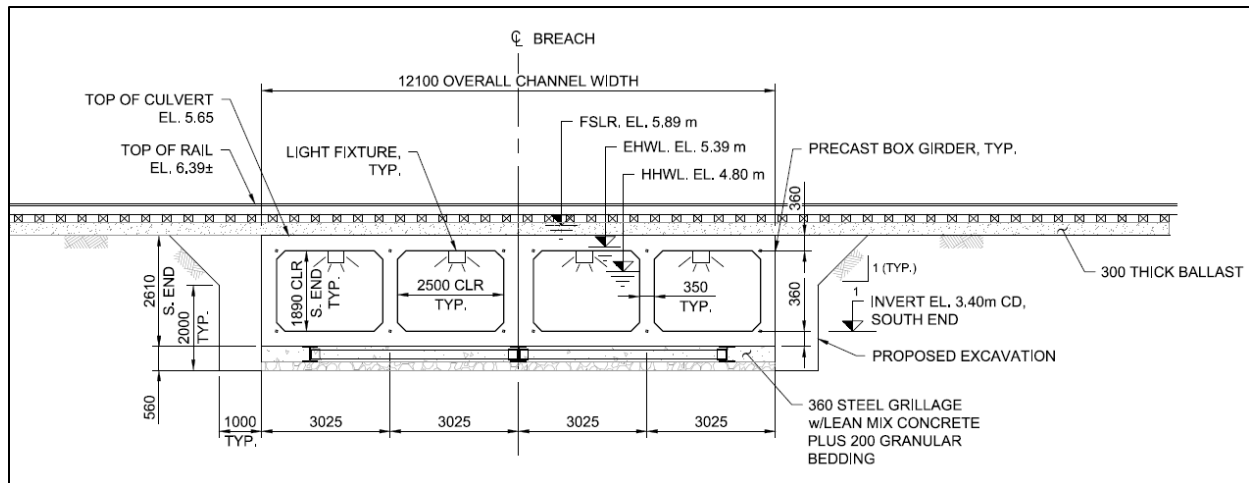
Typical Location 1 & 2 Channel Section Below Existing Causeway Tracks (Location 1 shown)
